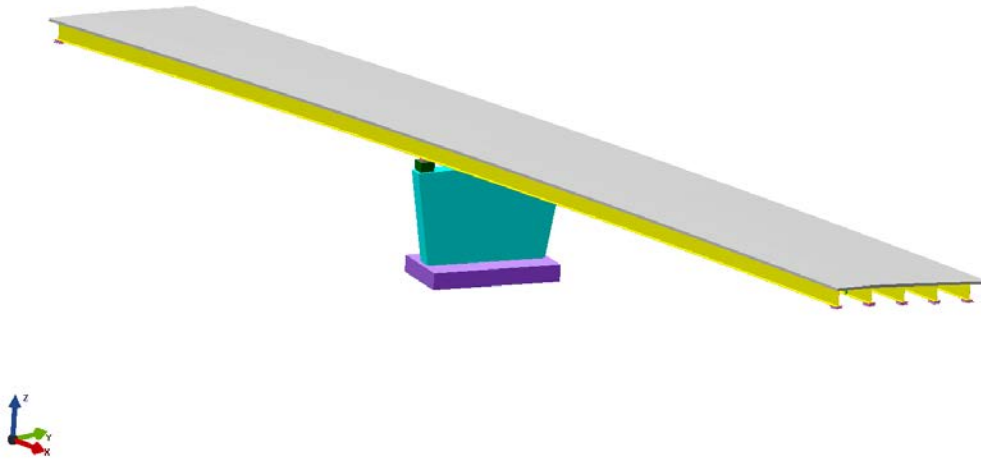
3D View of the Steel Case Study Bridge 3
